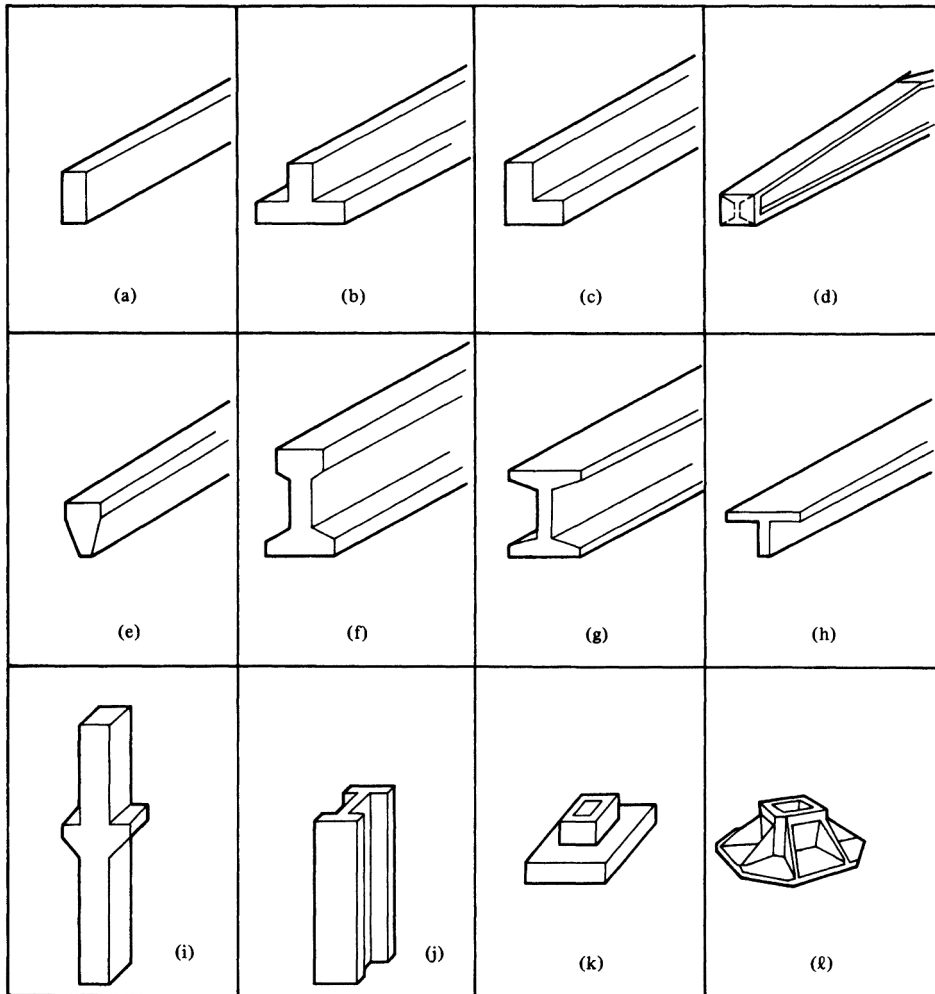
Typical linear prefabricated elements: (a)-(d) beams; (e), (h) joists; (f), (g) girders; (i), (j) columns; (k), (l) footings
